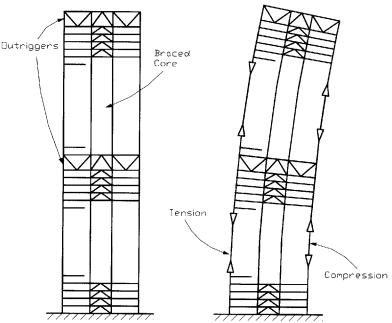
Behavior of Outrigger Braced Structure Under Load.
